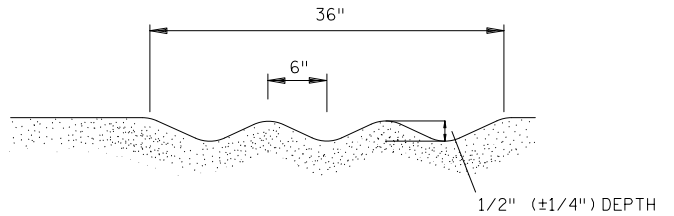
CONCRETE PAVEMENT OPTION A - STRUCTURAL RUMBLE STRIP
